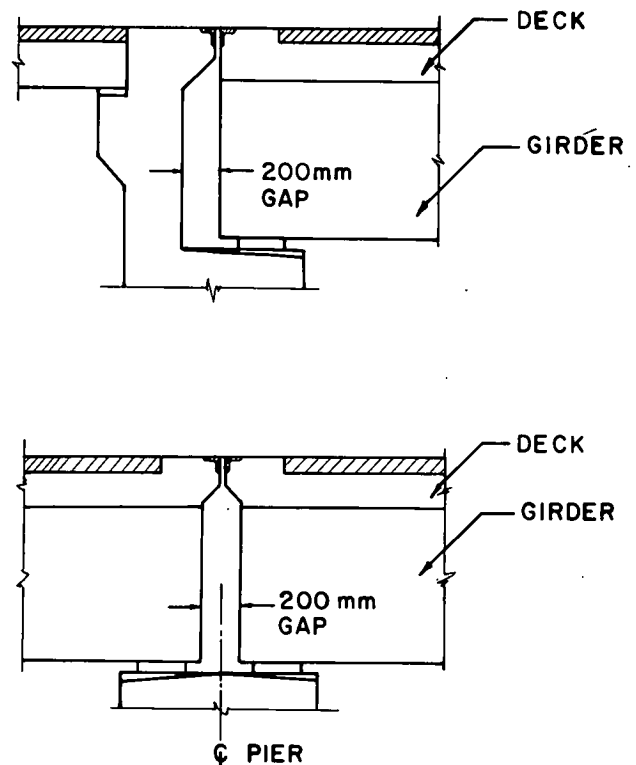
Gaps at abutment and pier. [From Ontario Ministry of Transportation and Communication, 1983]
